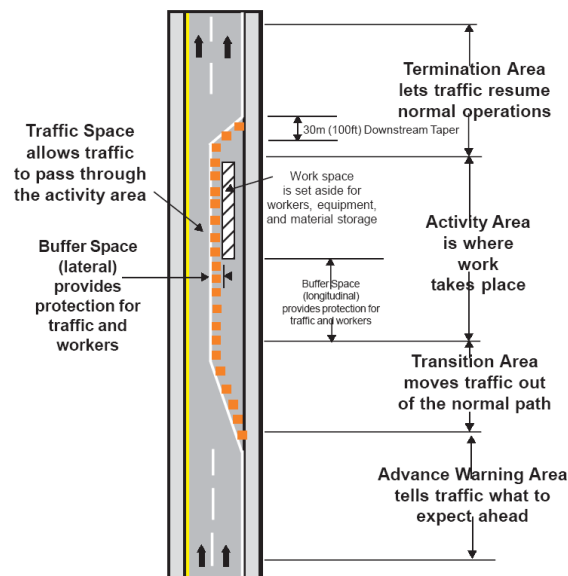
Prepare Work zone components, supplemented with the diversion plan before taking up any construction activity to enhance the safety.
